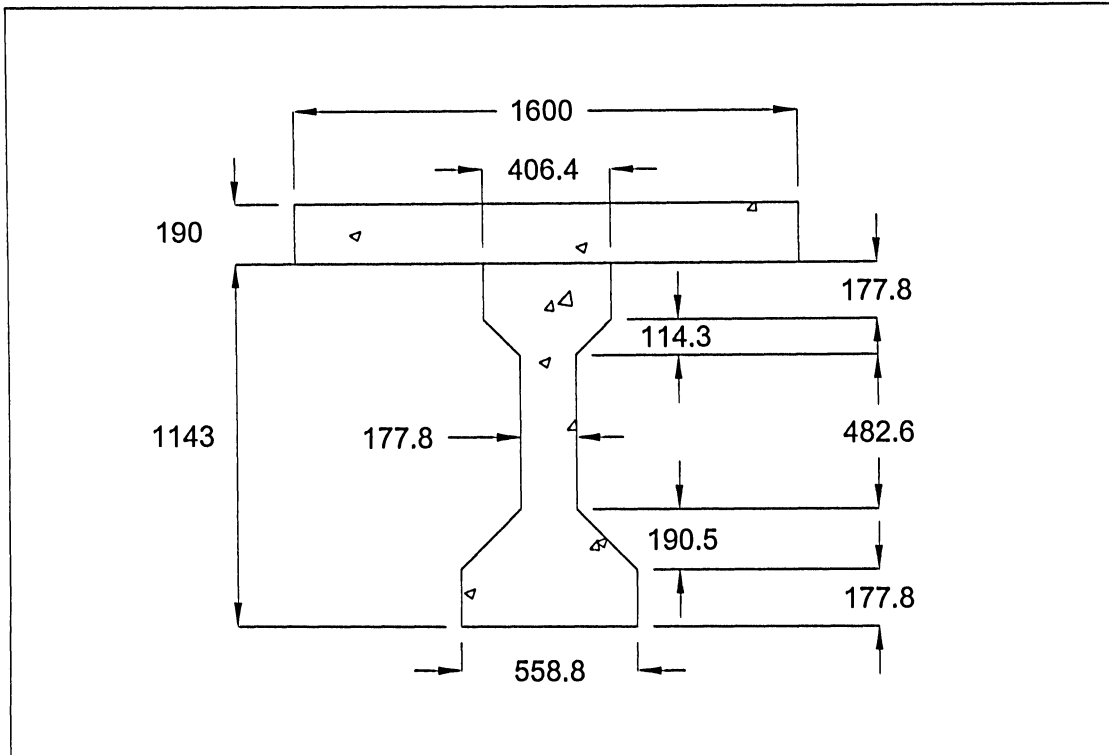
AASHTO Type III girder cross sectional dimensions
